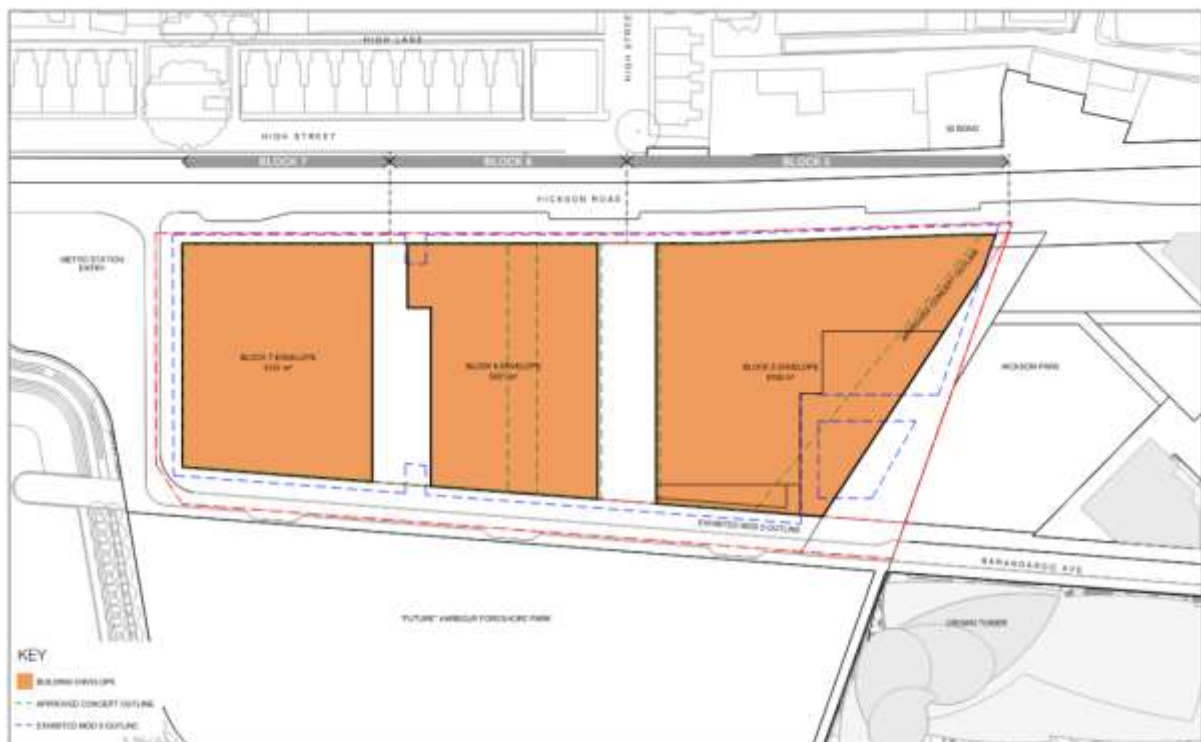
AMENDED CONCEPT BUILDING ENVELOPE (SJB)
